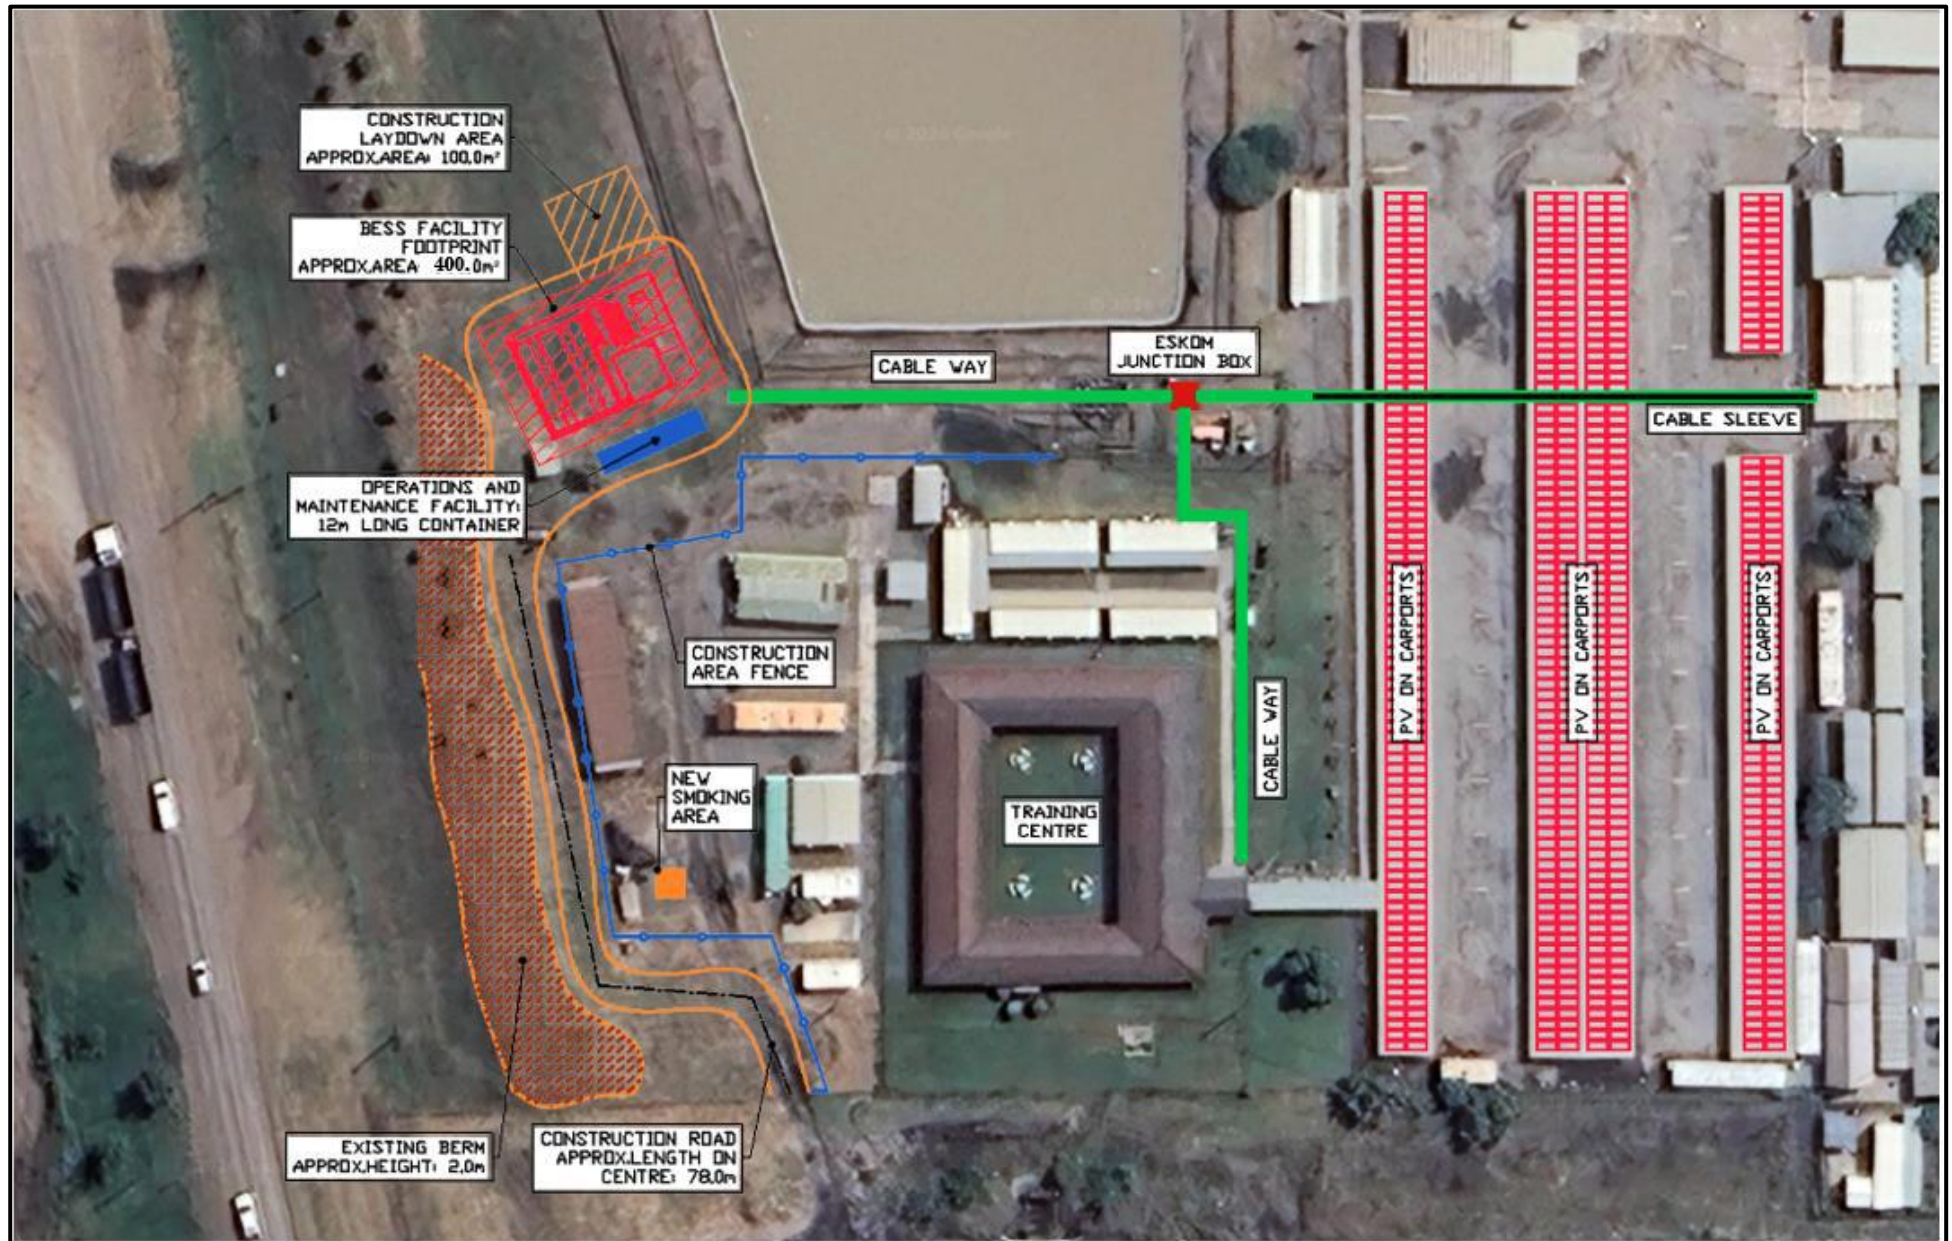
Site Layout for the proposed Tharisa BESS Development – Alternative 1
